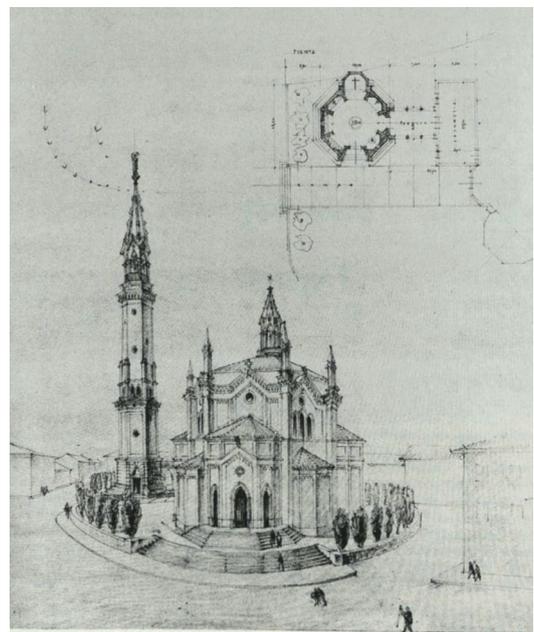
Zanini, Perspective of the first bell tower project near the cathedral, with plan. Zanini Archive, Civici Musei, Udine.
